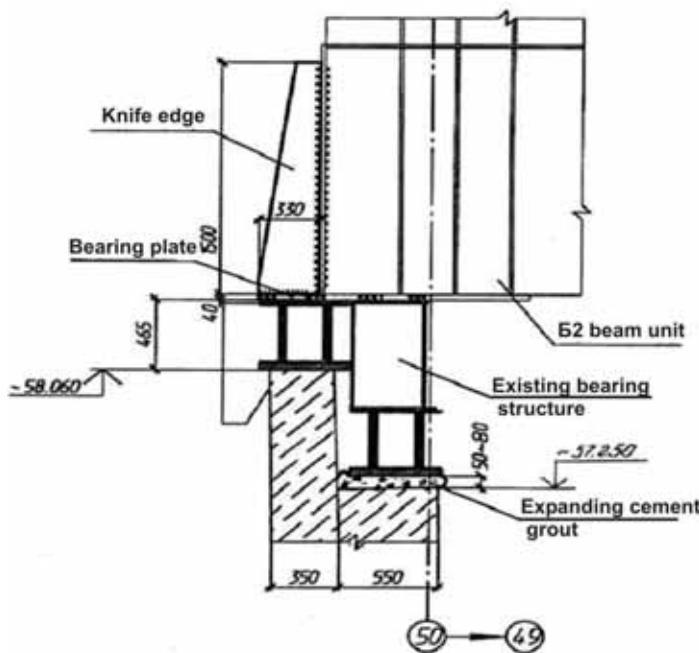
Strengthening of supporting parts B2 beams and metallic supports under B2 beams in place of B2 beams unit abutting on ferroconcrete wall along axis 50 (row II)
